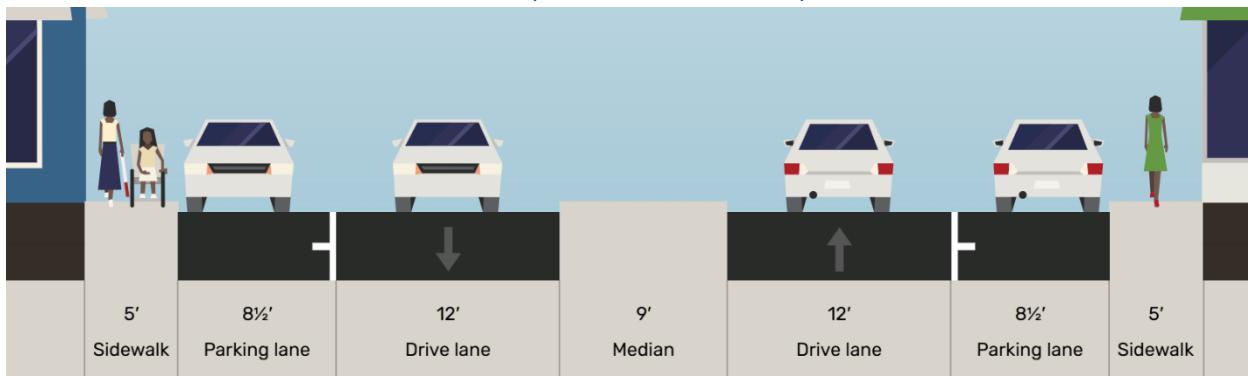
EXISTING TYPICAL SECTION (ELYRIA AVE TO 10TH ST)
